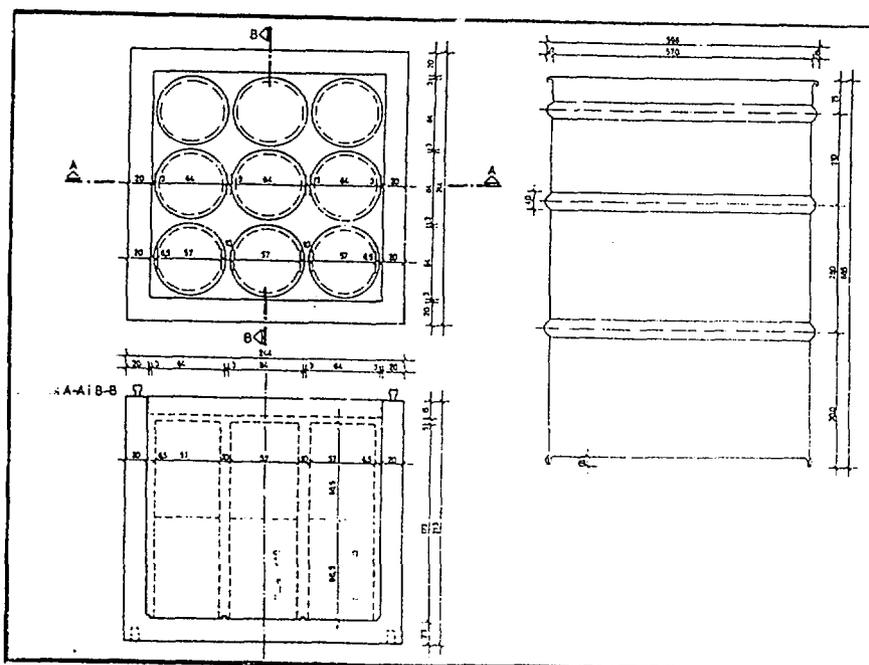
Reinforced concrete (RC) containers for LL/IL radwaste
